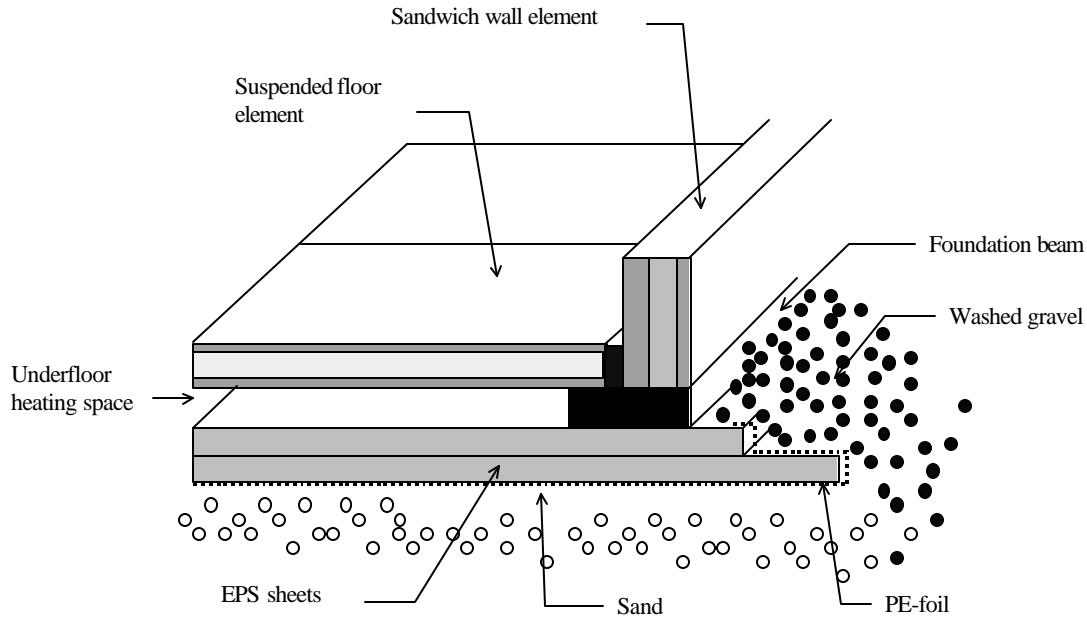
Sketch of the Termogrund. Seen from above: The suspended floor element, the foundation beam and EPS sheet. A heat convector (not drawn in the figure), situated in the heating space, distributes warm air to the corners of the space by means of ducts.
